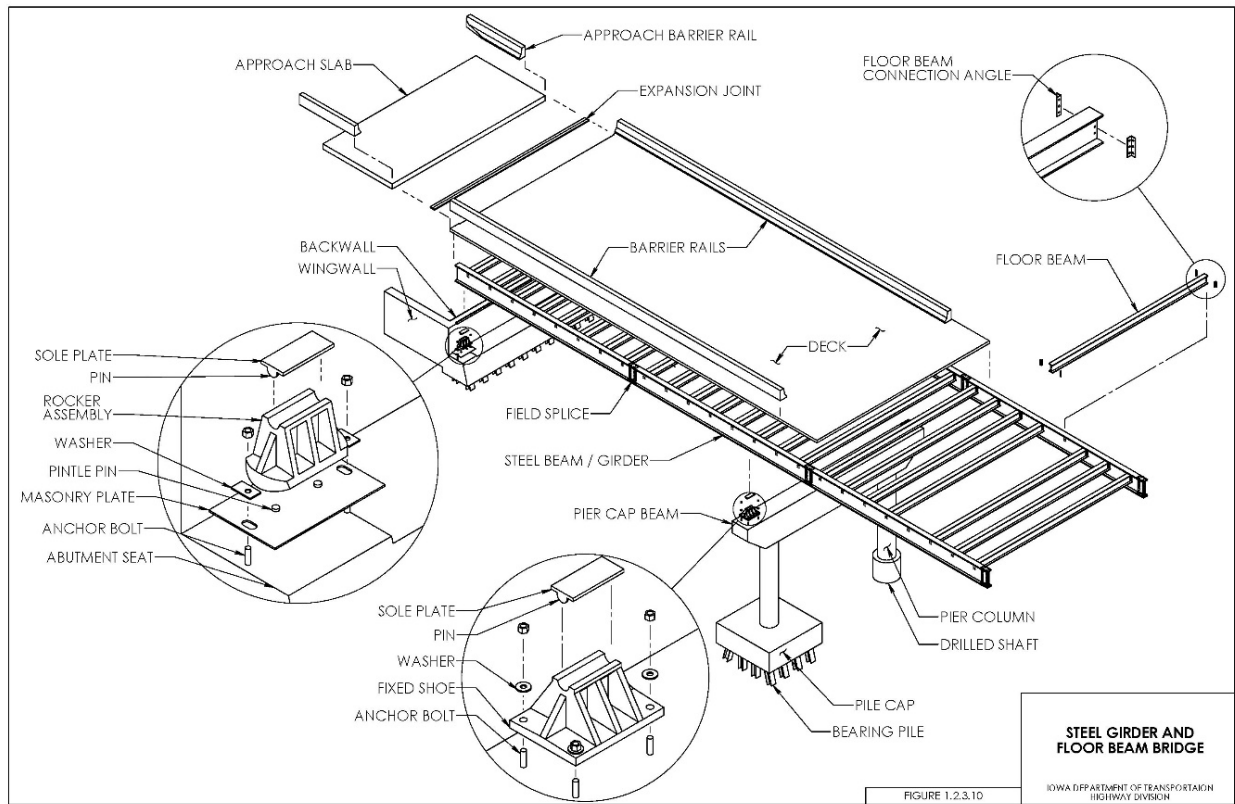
Steel Girder and Floorbeam Bridge Components
